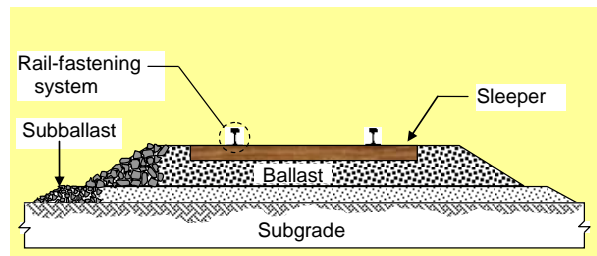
A typical ballasted railway track cross section indicating main components of rail substructure
